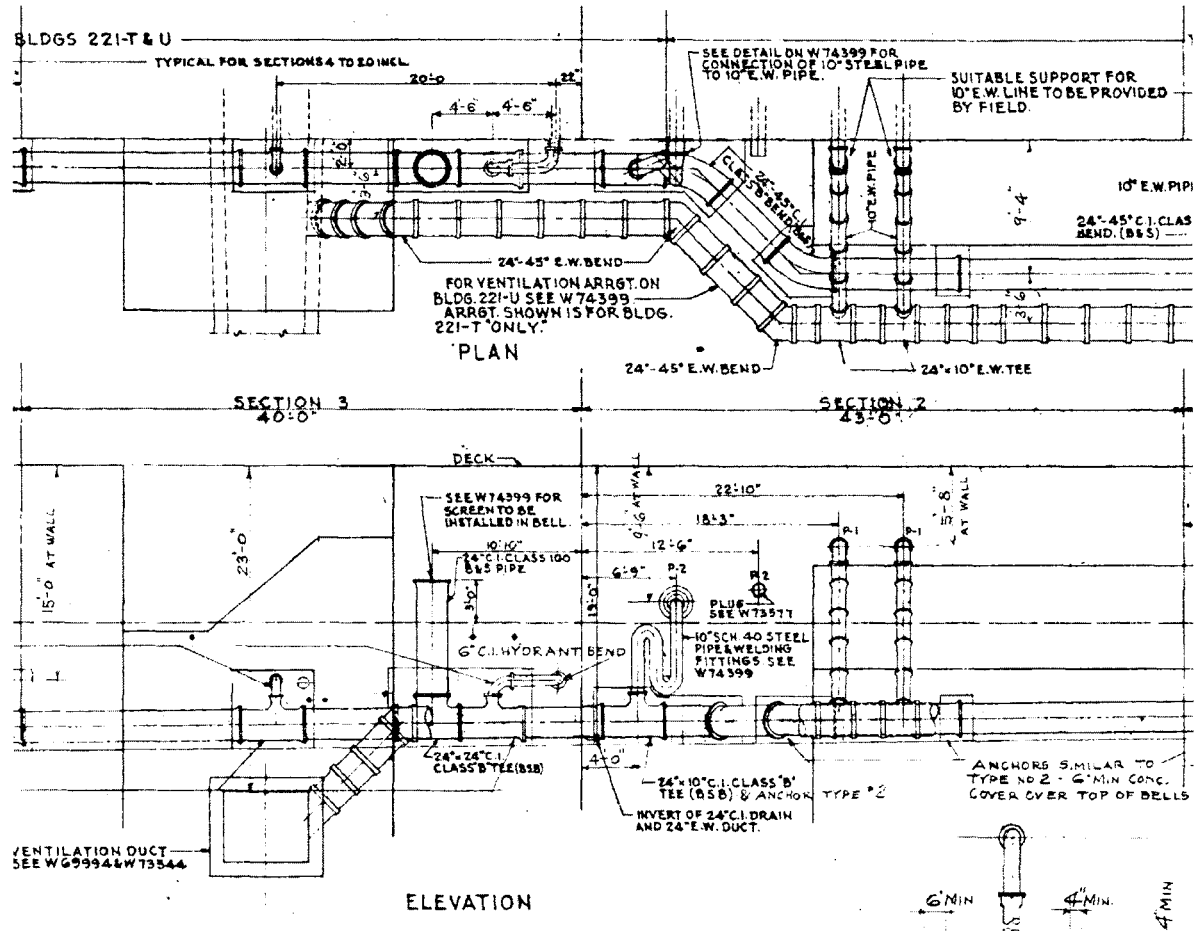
24" Vent Pipe and Connection to Ventilation Duct
